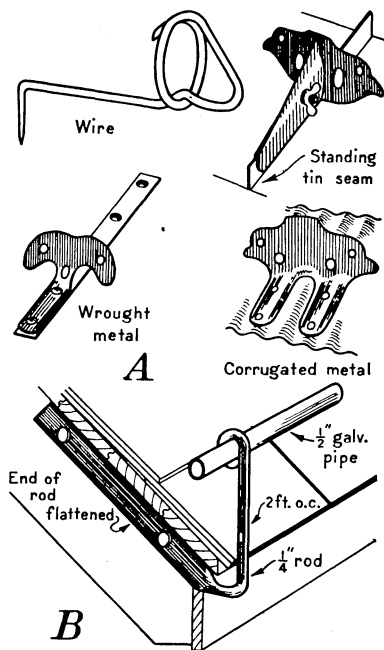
Snow guards: A, Common types installed at time of placing roof covering; B, home-made type.
